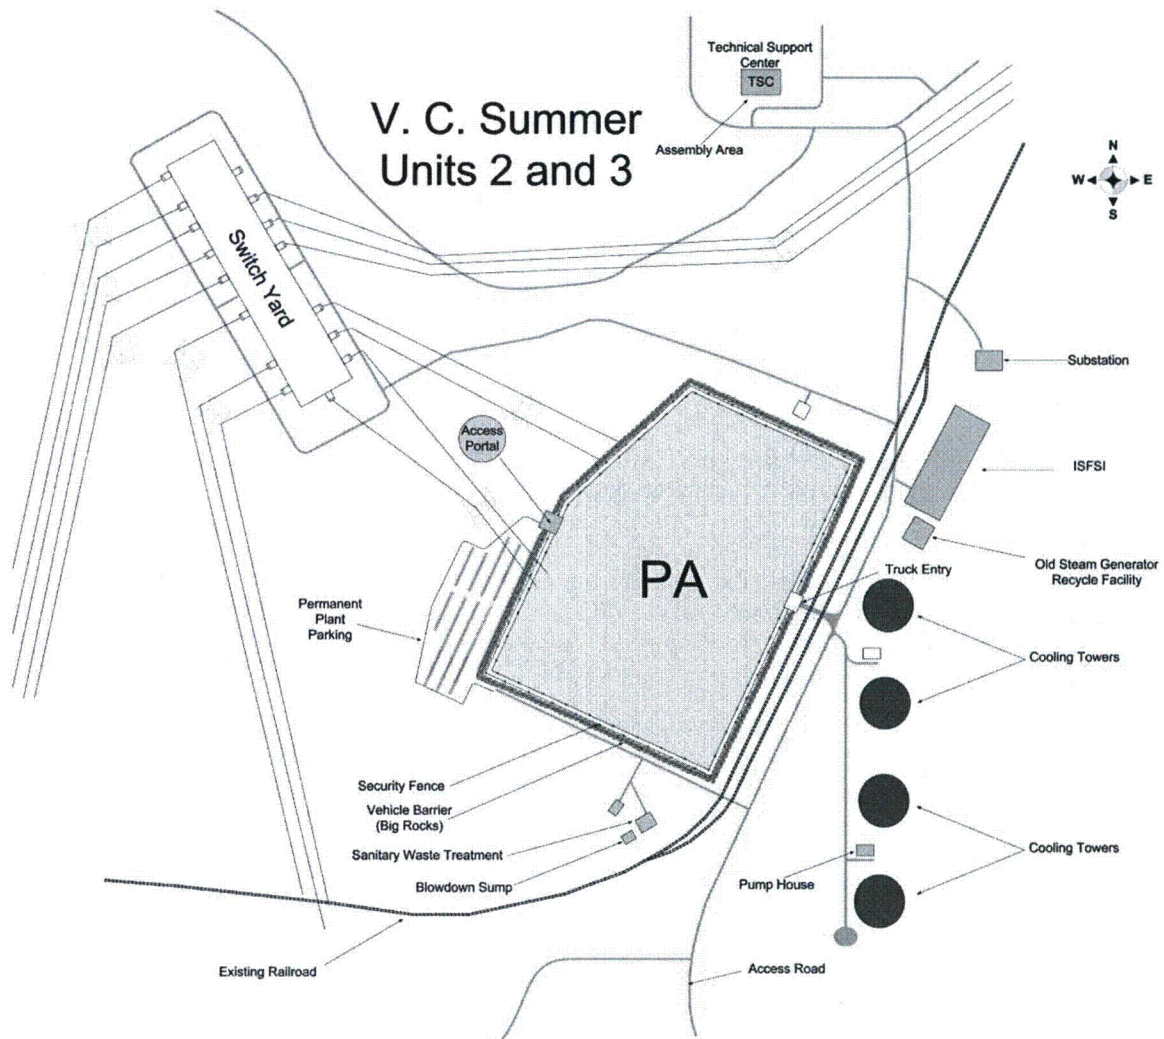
Units 2 and 3 Facility Layout (specimen)
